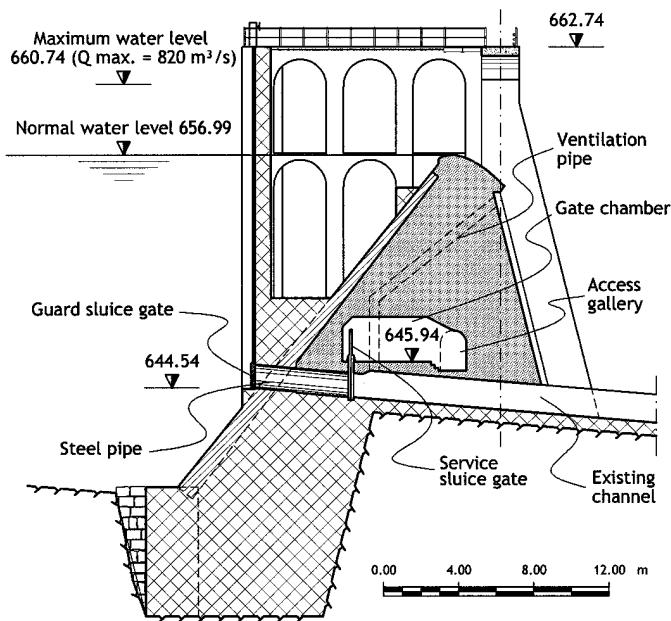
Typical cross section of the existing bottom outlet on the right dam side after rehabilitation.
